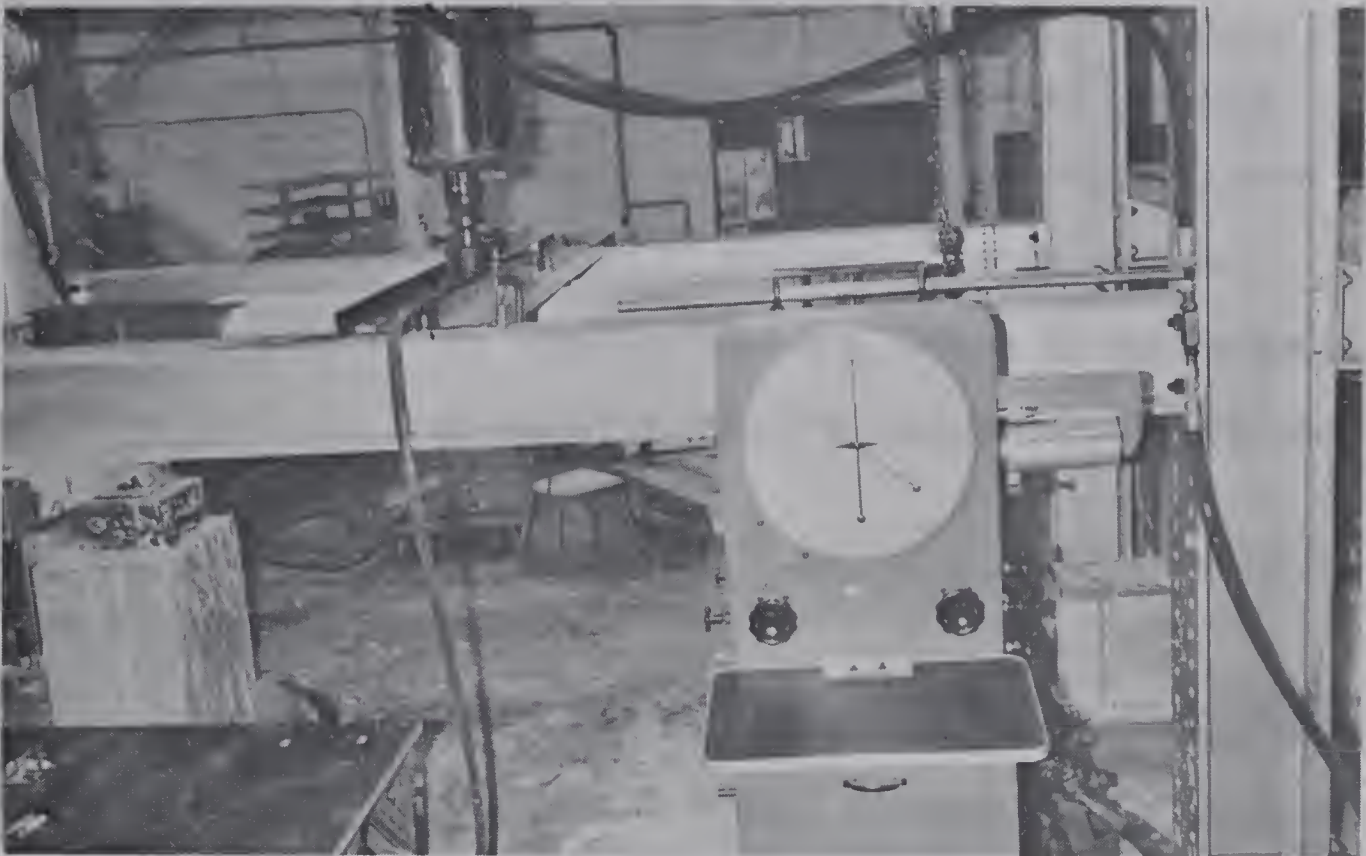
TEST ARRANGEMENT AND BEAM INSTRUMENTATION
